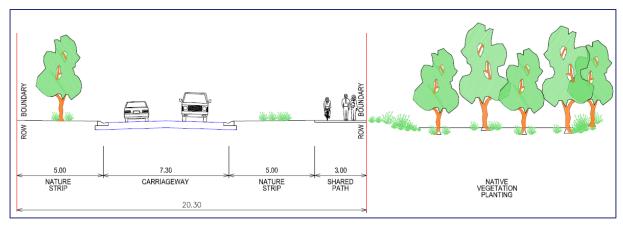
Local Road Adjacent to Native Vegetation Area – Section K
